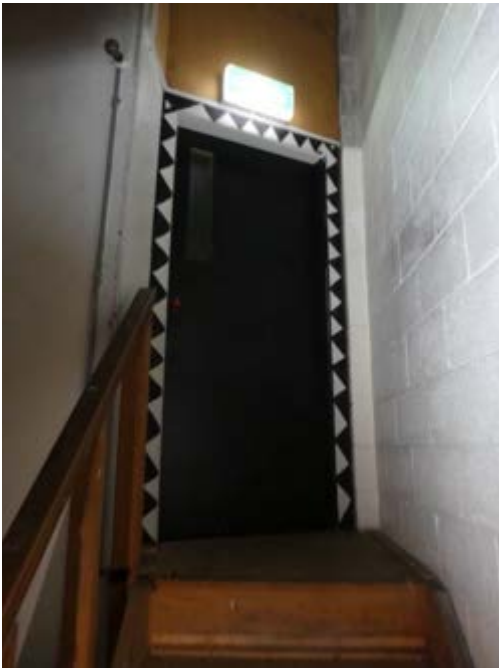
Showing defective flooring and low level plaster within the north western stairwell.
